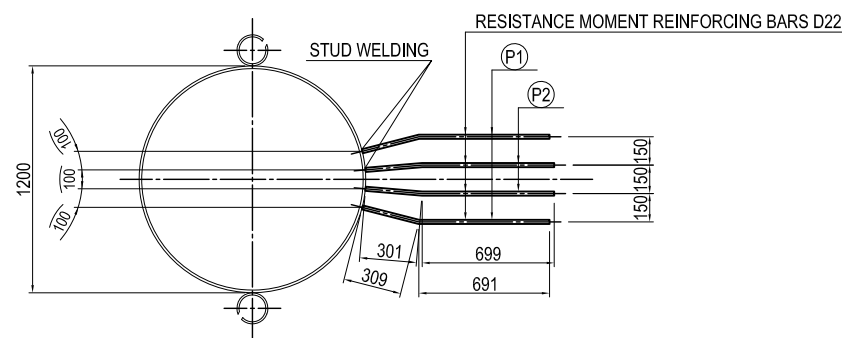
DETAIL OF CONNECTION BETWEEN STEEL PIPE SHEET PILE AND FOOTING OF P10 PIER
